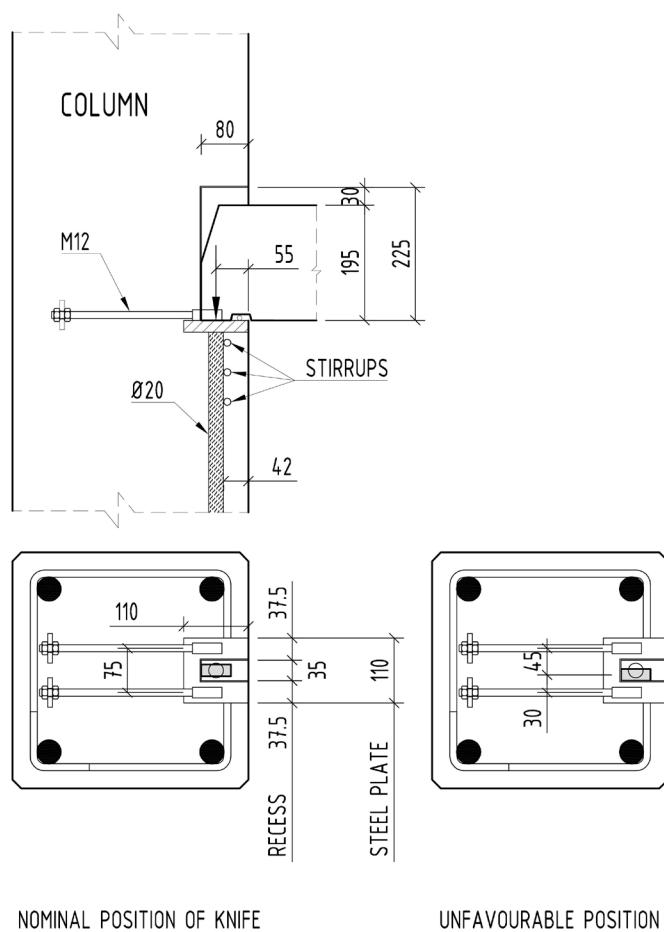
BSF225 column unit. (Centre stirrups are not illustrated.)
